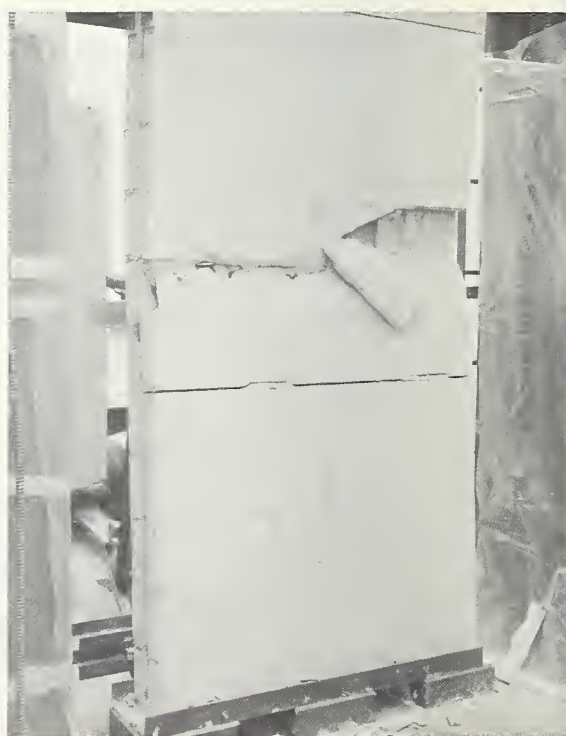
Typical failure of brick walls with low vertical compressive loads.
